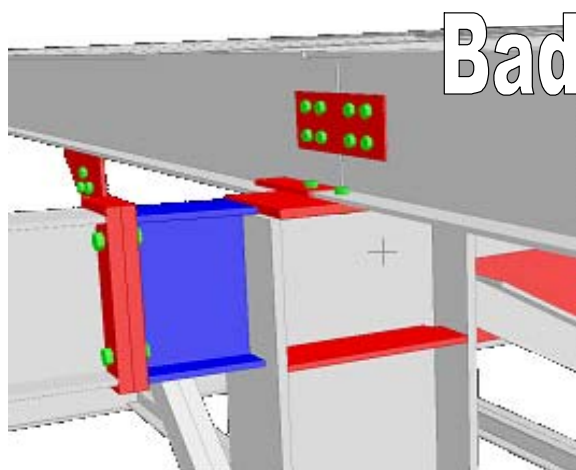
Beam to column joint, moment connection to major axis of column, simple connection to minor axis, unsuccessful solution because of instability during erection and expensive solution difficult to fabricate and erect; beams IPE 330; bolts 4xM20; moment connection: end plate resistance $M_{j,Rd} = 98,4 \text{ kNm}$; weld resistance $M_{j,Rd} = 297,3 \text{ kNm}$
